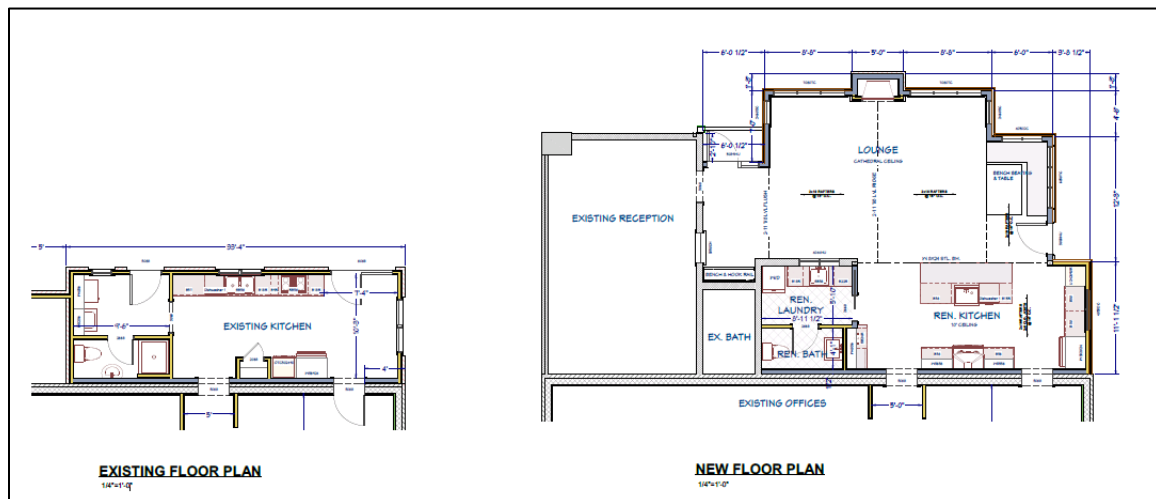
Existing Floor Plan and Proposed New Floor Plan
